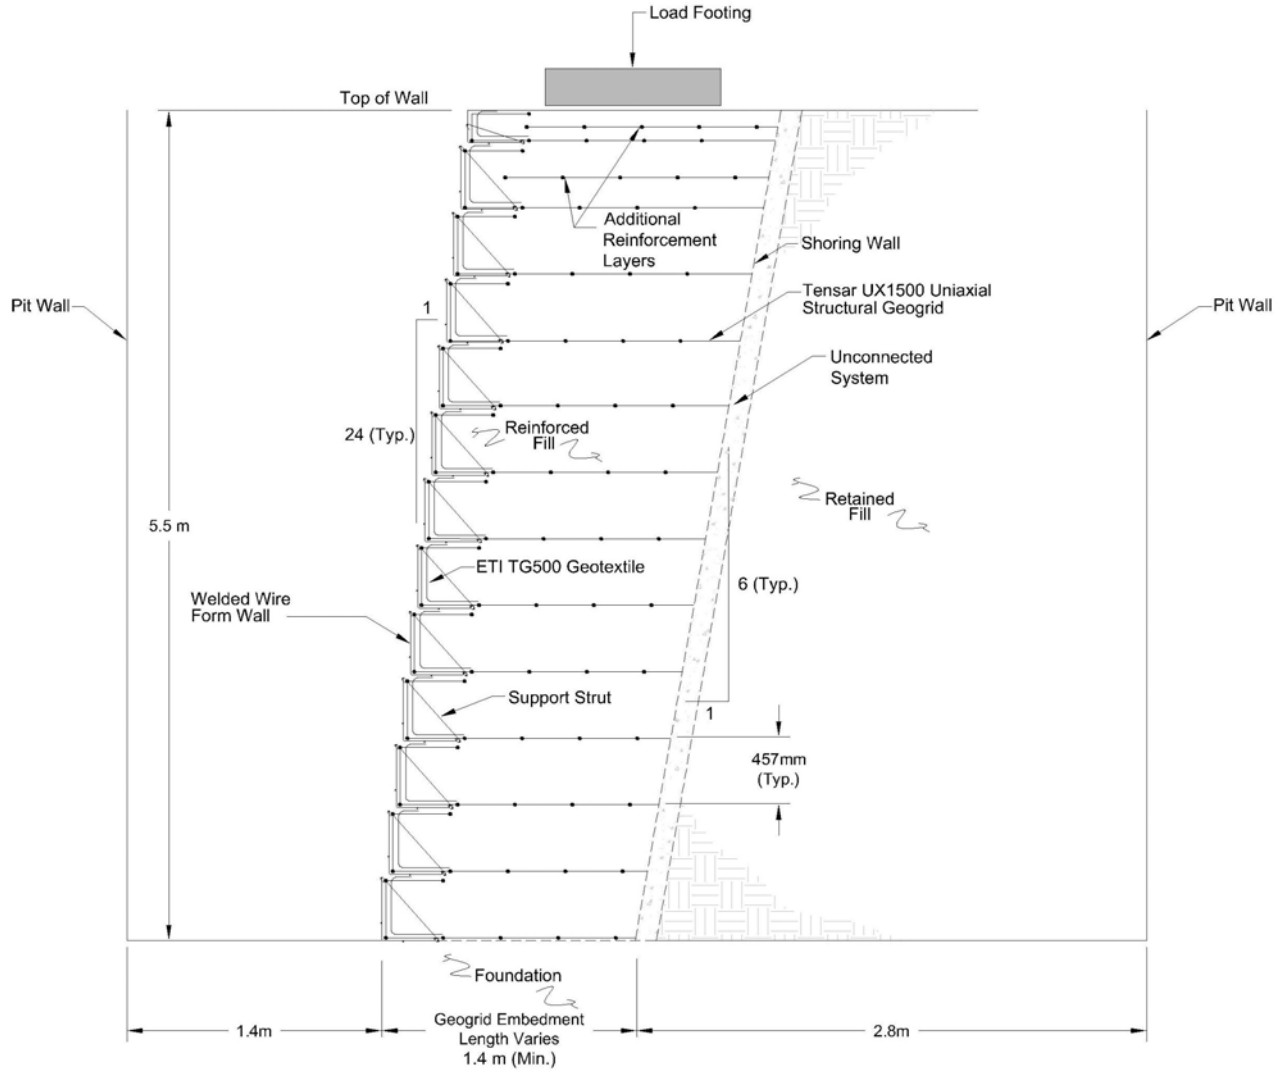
Schematic. Typical field-scale test wall cross section with unconnected system.
